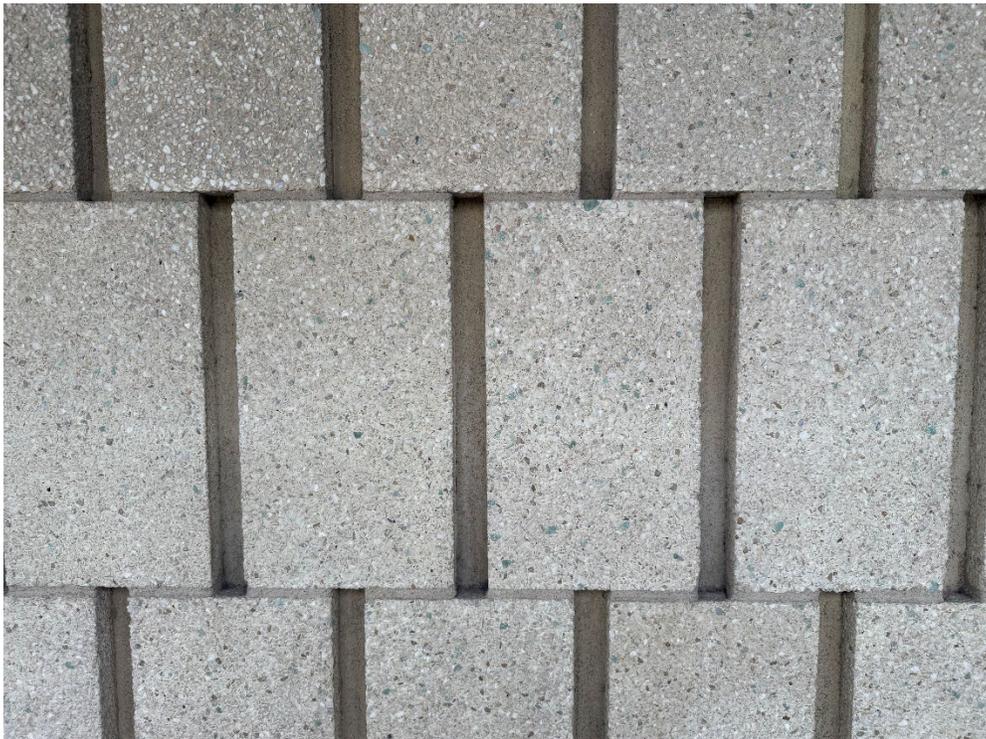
Detail of cast stone concrete, north facade, facing south (Tucson Historic Preservation Office, Jan. 2026).
